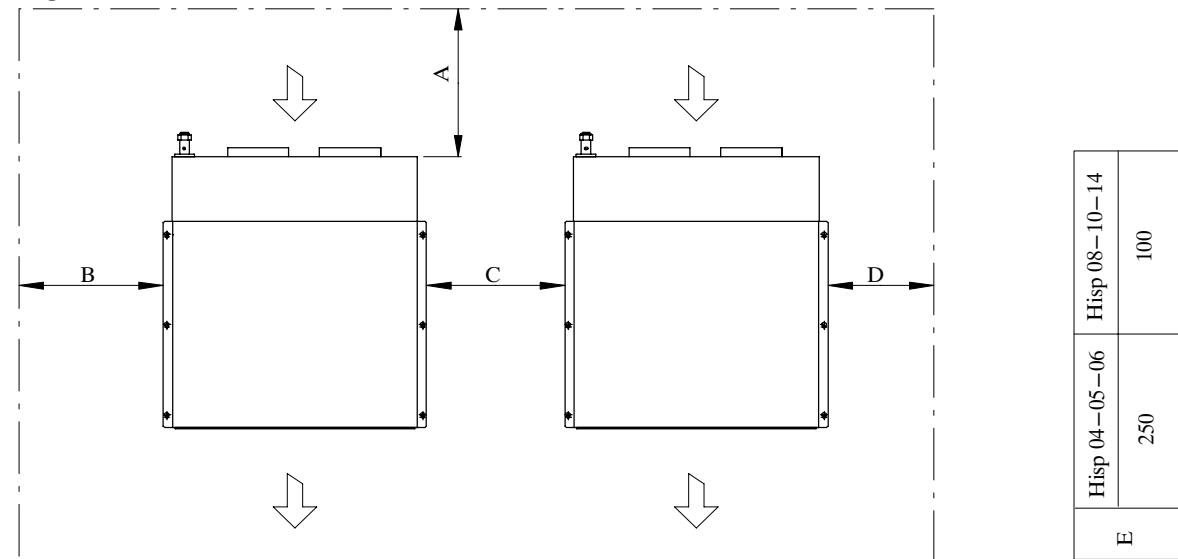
Wall fixing of condensing unit / Fissaggio a parete unità motocondensante
